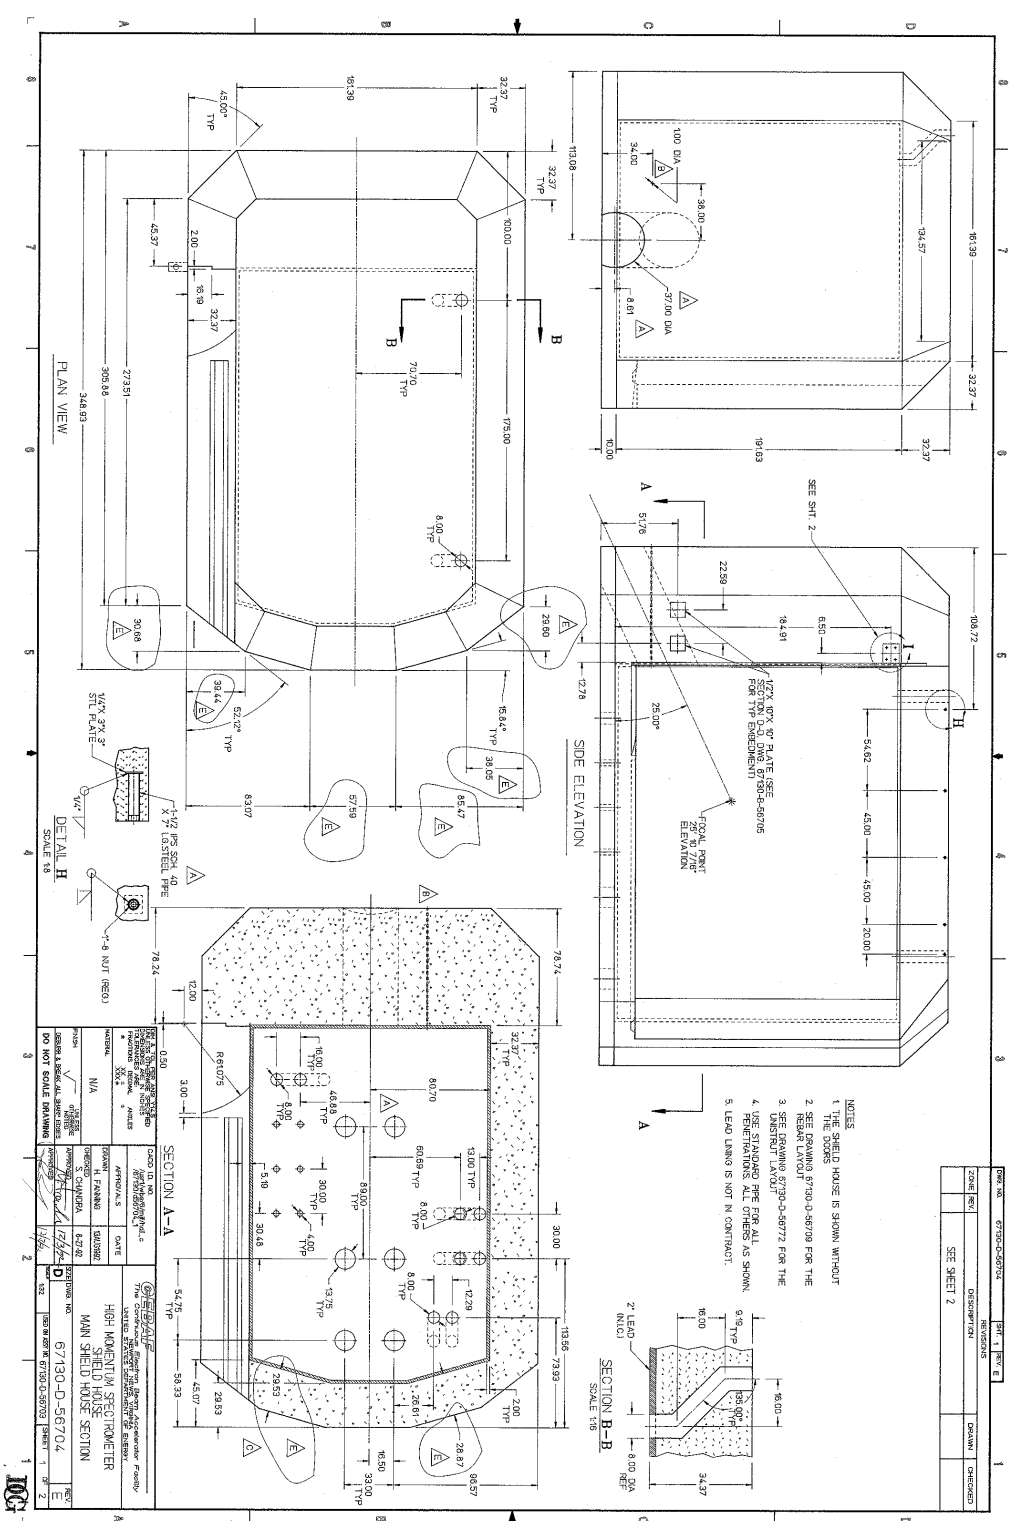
HMS shield house drawing E-67130-56704 (part 1).
